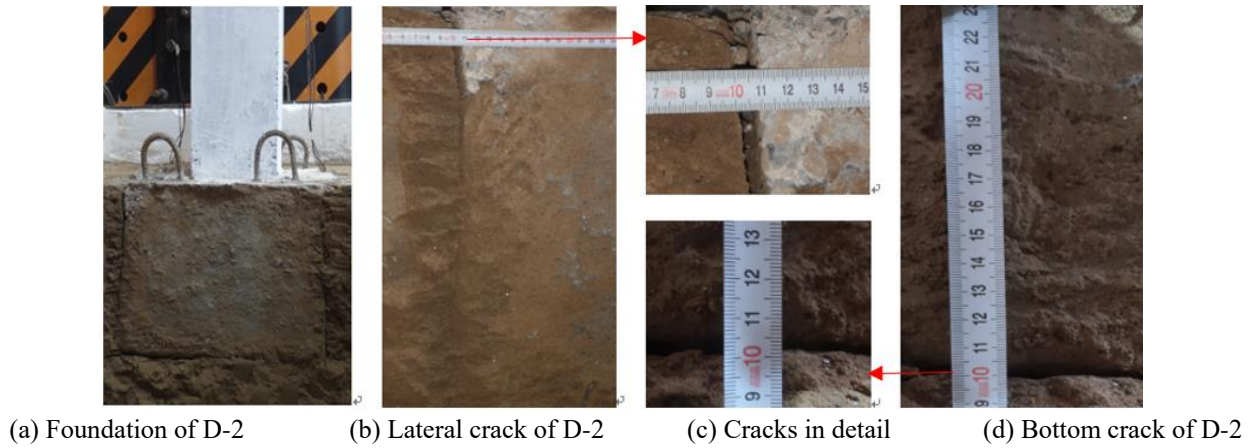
Failure phenomenon of the D-2 foundation after testing
